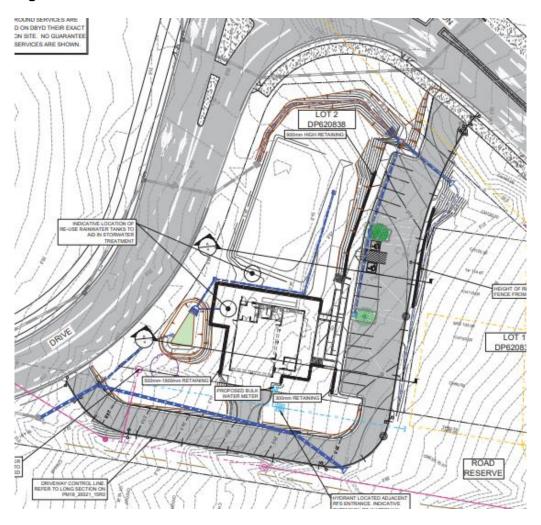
Design Layout for RFS Shed, driveways, carparking, and pad for future Preschool
